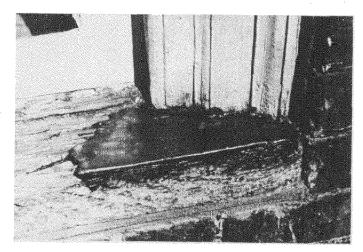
This illustrates a two-part epoxy patching compound used to fill the surface of a weathered sill and rebuild the missing edge. When the epoxy cures, it can be sanded smooth and painted to achieve a durable and waterproof repair. Photo: John H. Myers
